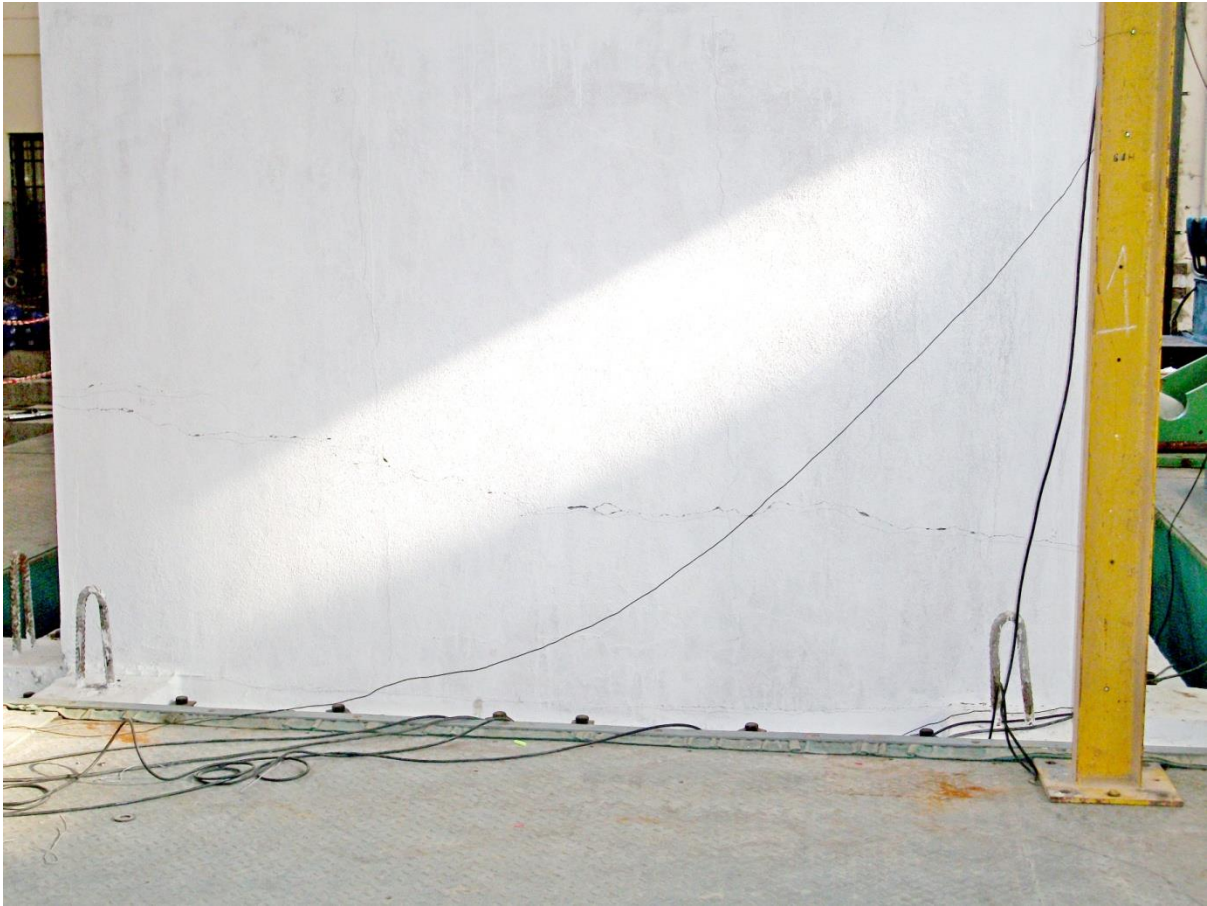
Cracks at the bottom level in the eastern wall with door opening
